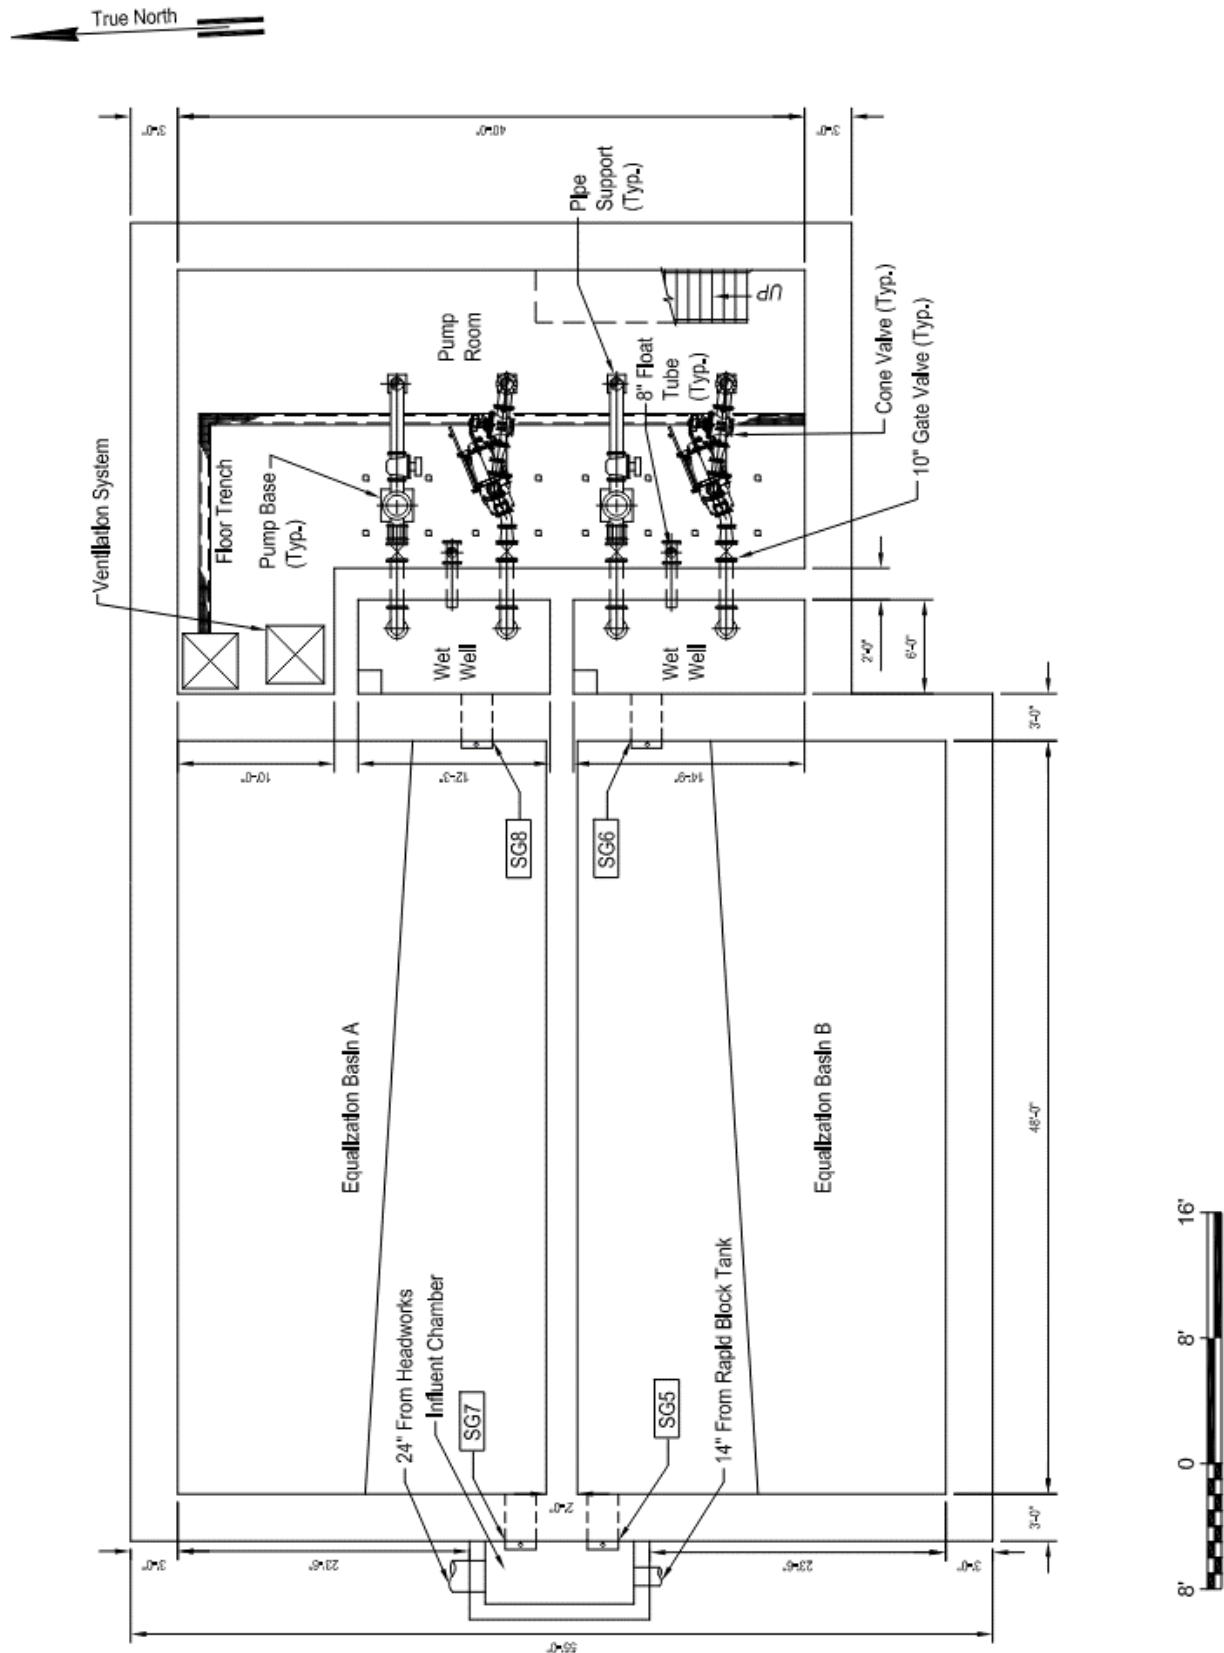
Plan View of the Existing EQ Basins and EPS
